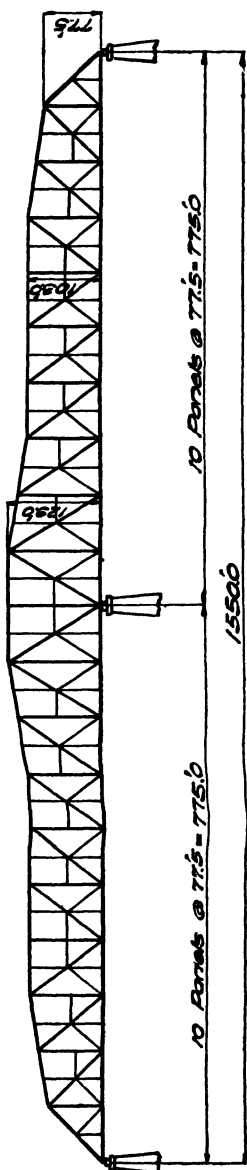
Layout of Petit-Truss, Continuous Spans.
